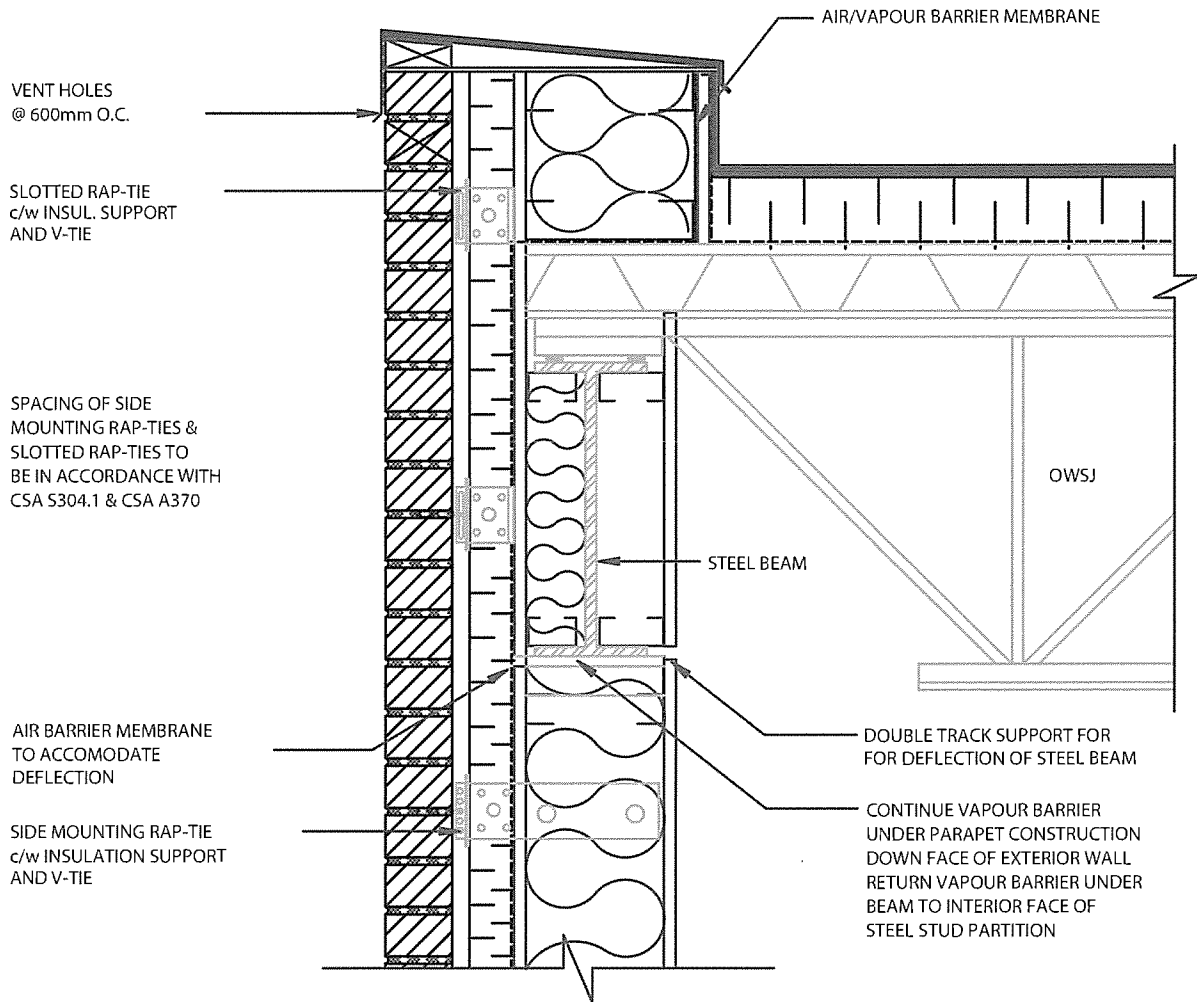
BRICK VENEER / STEEL STUD - PARAPET DETAIL @ O.W.S.J.
